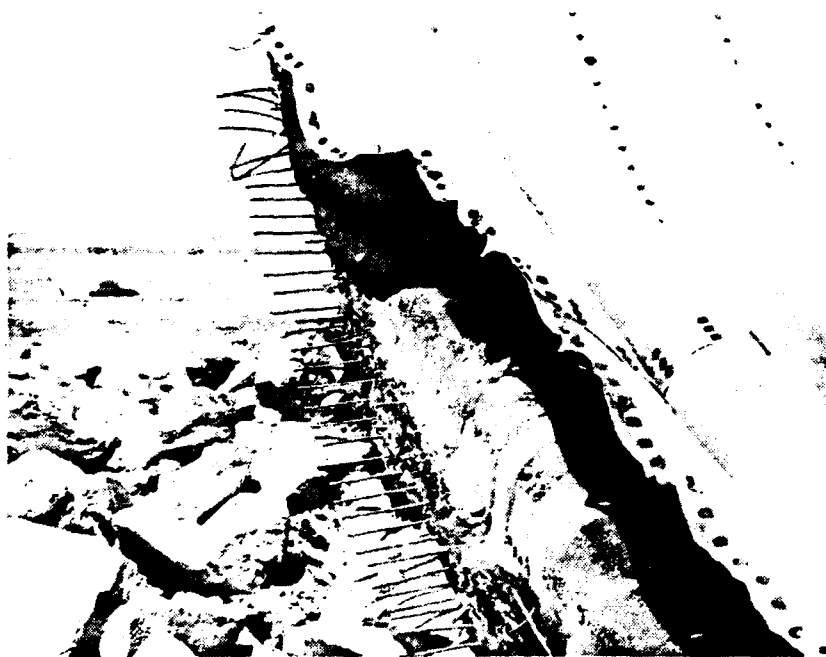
Typical bolt pull-out at liner joint, PAS-3.
